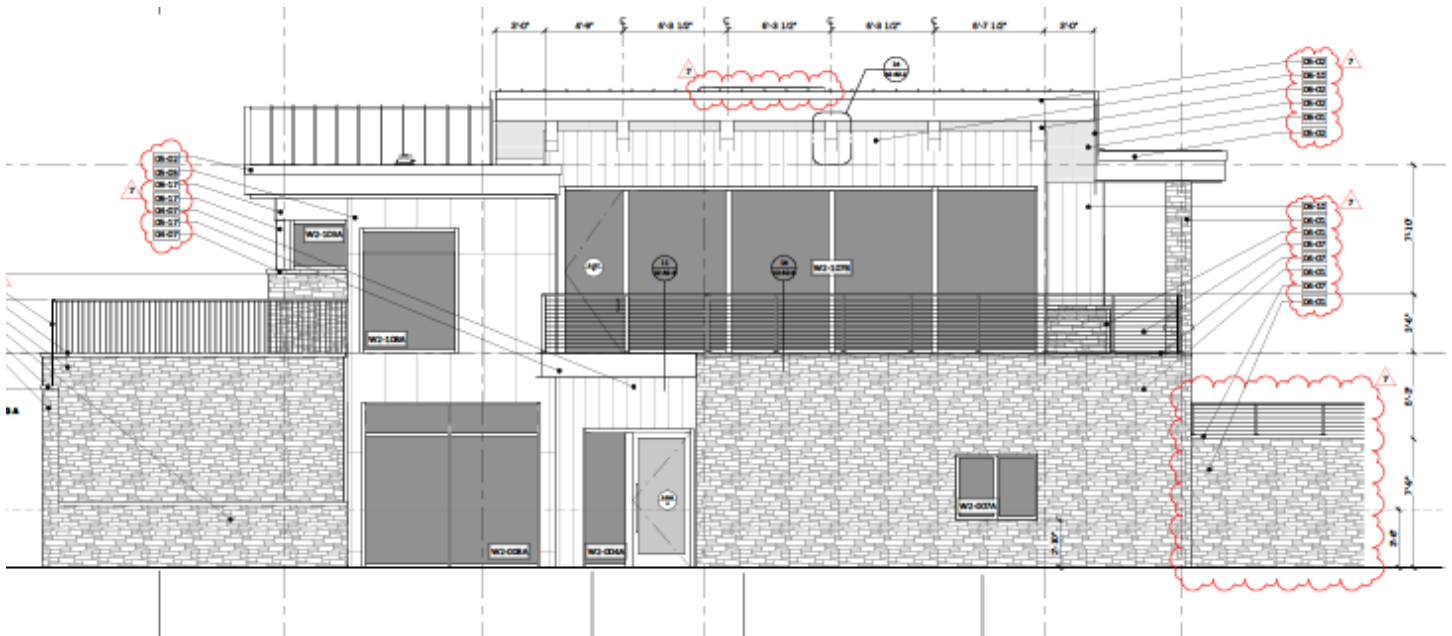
EXHIBIT E – Current and Proposed HOA Building Elevation Plans
